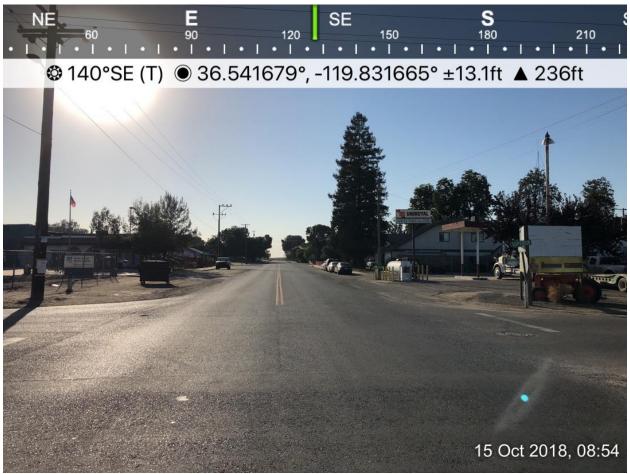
West Superior Ave at the site of Well No. 6, facing South Henderson Road.
